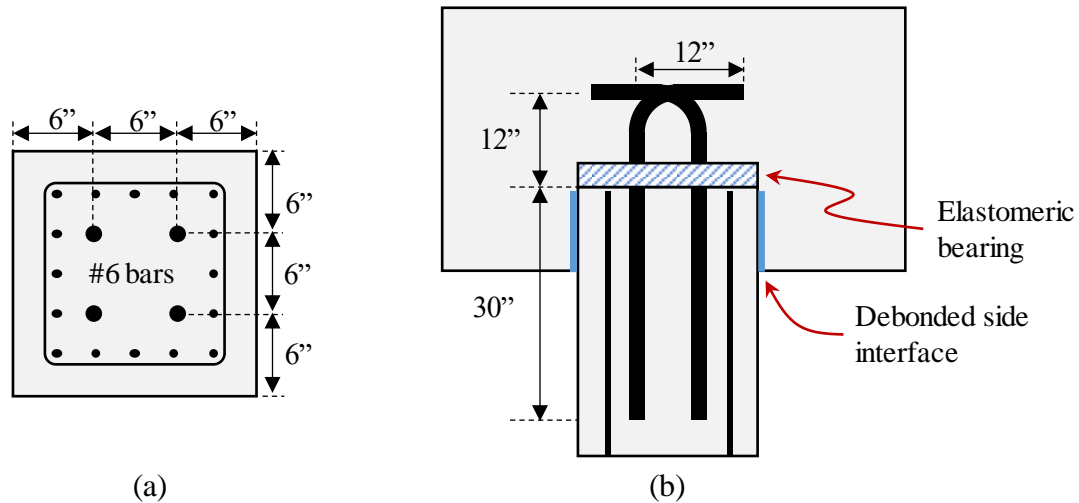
Idea for pinned connection between pile and pile cap (a) cross section and (b) elevation
